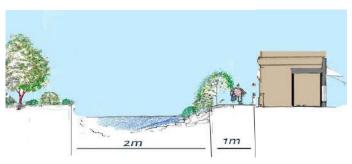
Conceptual cross section of the proposed storm water drain design with the walking path
